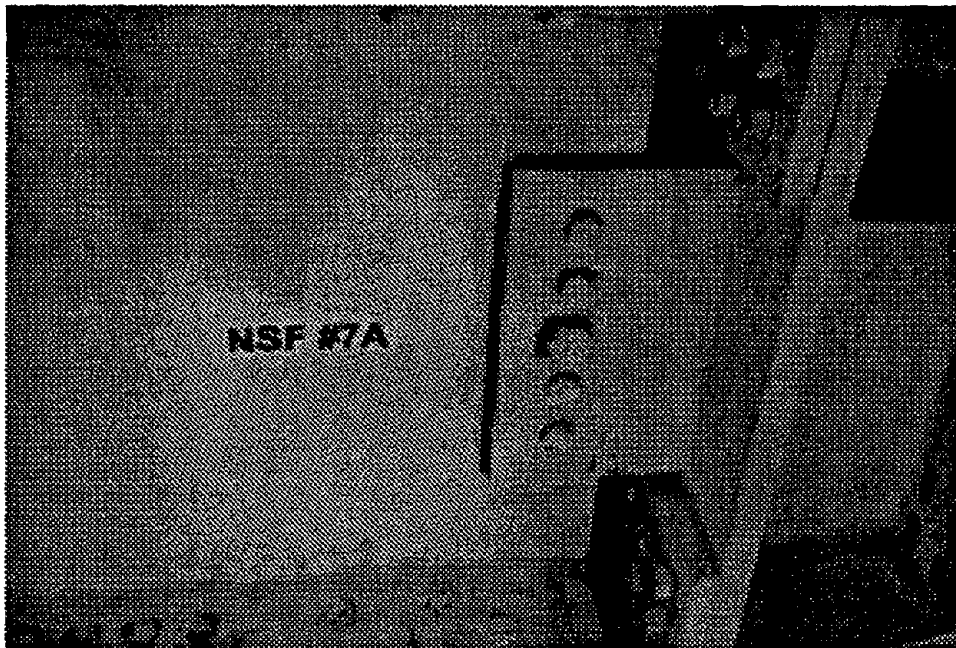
Shear plate of Specimen 7A shows no damage after the test. The beam has been pulled away from the column for half inch.
